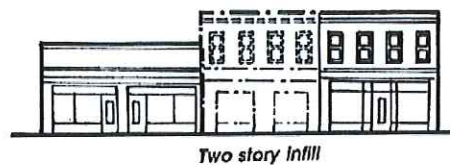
New construction should be similar to existing buildings in height, width and rhythm of openings
